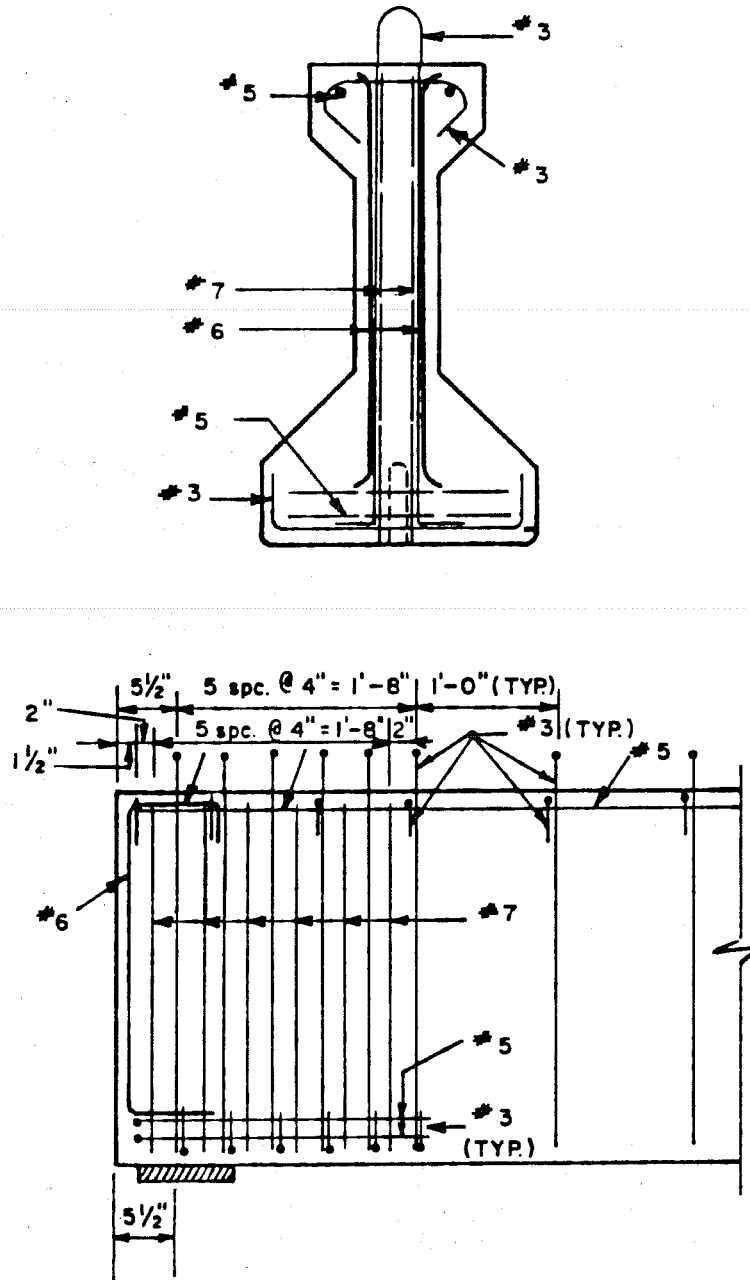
Texas SDHPT standard end reinforcement detail for Type IV girder
